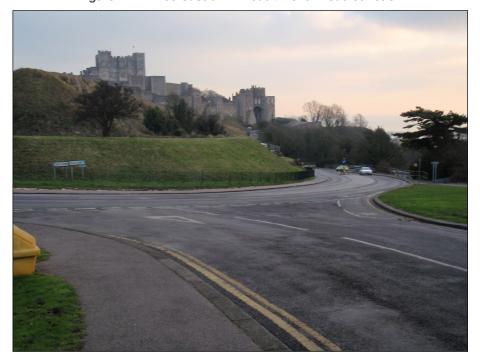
A258 Castle Hill Road / Dover Road Junction
